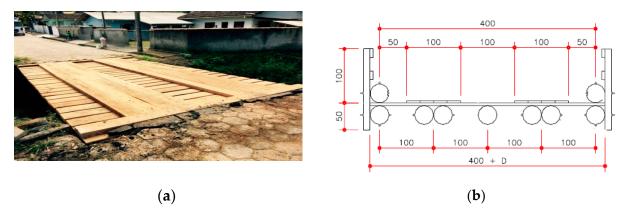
Timber bridge: Deck (a) and transversal view, in cm (b).
